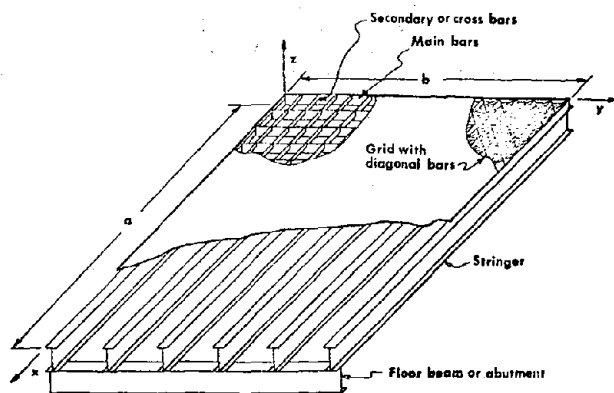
Open Grid Deck/Wide Flange Stringer Bridge System
